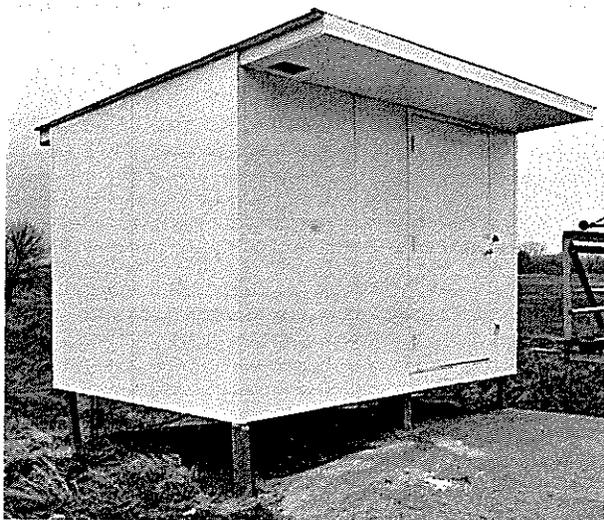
Construction details of instrument shelter for 18-inch (45.7 cm) stilling well.
